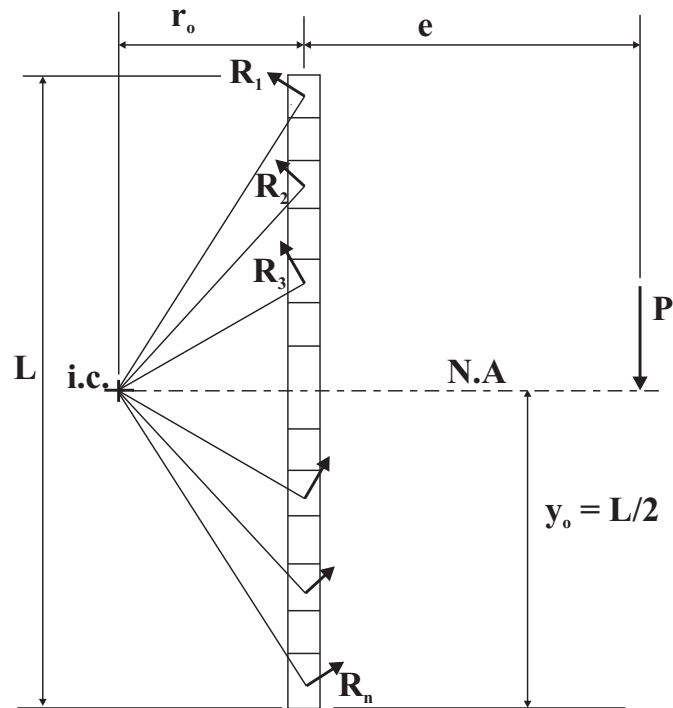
Eccentrically loaded fillet weld (AISC Approach)
